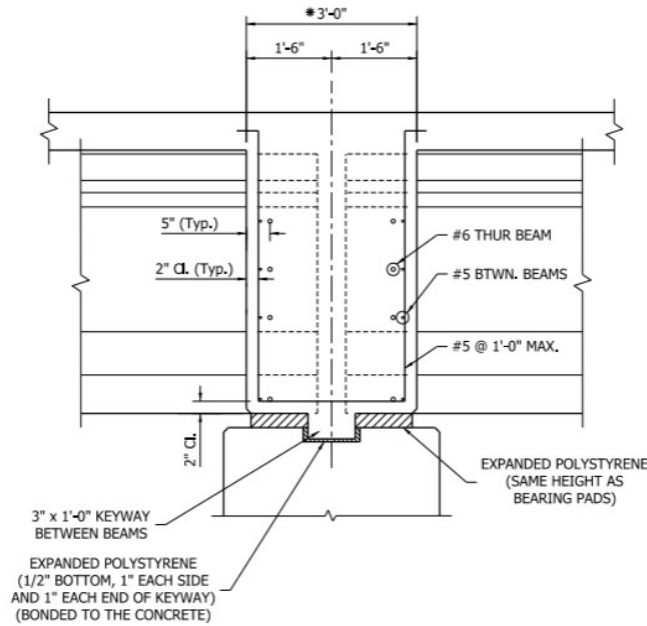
Elevation Detail of Typical Interior Diaphragm of Bridge (NBI 5941) (2014)
